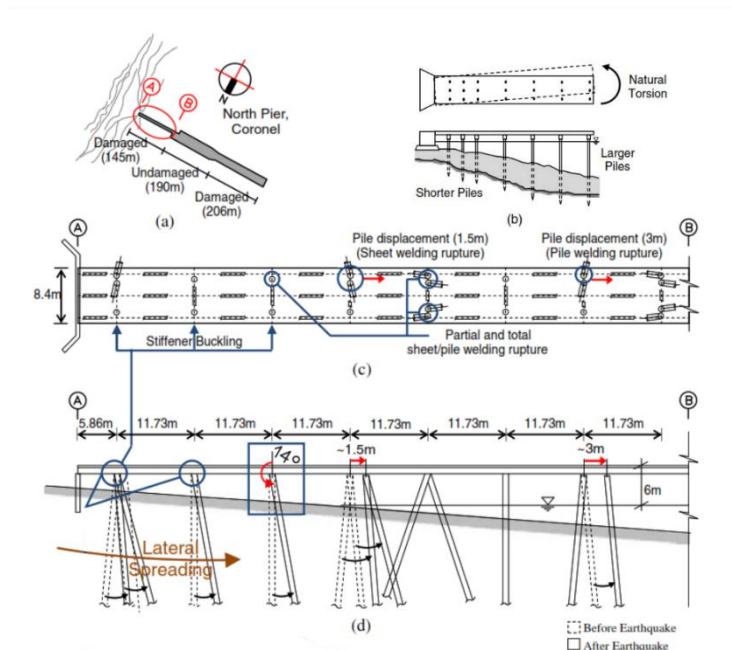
Distribution of the earthquake-induced damage of the approach end of the North Pier in the city of Coronel, Chile, after the M_w 8.8 Maule earthquake of 2010 in. Adapted from (Brunet et al., 2012). General plan view of the pier (a). Schematic of the short pile effect and natural torsion (b). Pan view of the approach zone (c). Cross section of the approach zone (d)
